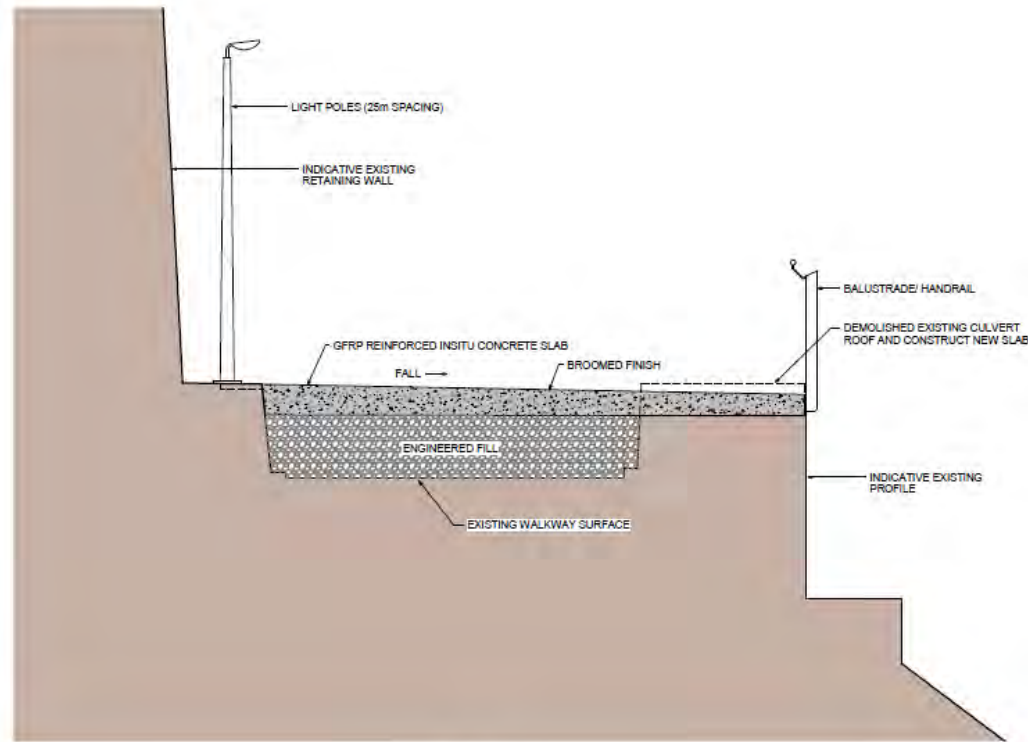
Option 3 - Widen Path with Bleachers, Access Ramps & Maintain Walkway Alignment – Section E
